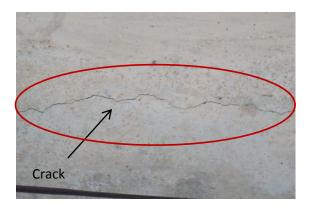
Horizontal Crack on Vrandah Beam of Shop No. 326B, (G.F.), Approx. Width = 0.15mm, Approx. Length = 2.10m. Distance from L.H.Column =1.50m,Height from Floor =3.00m.
